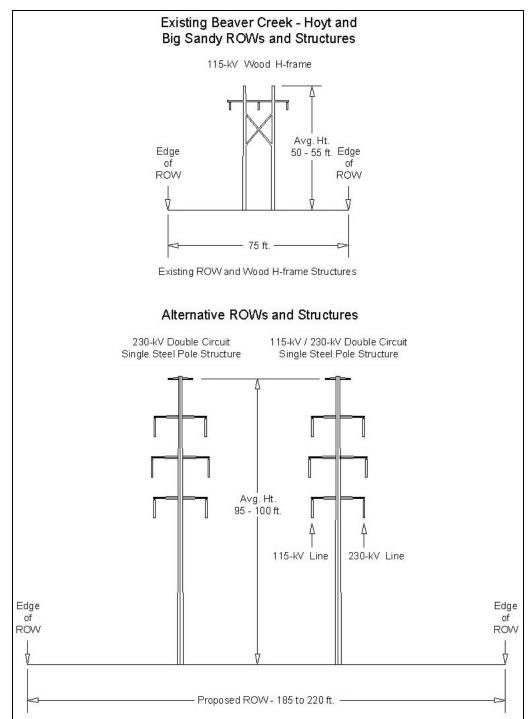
Beaver Creek-Big Sandy Reroute Alternative, Existing and Alternative ROW and Structure Designs
